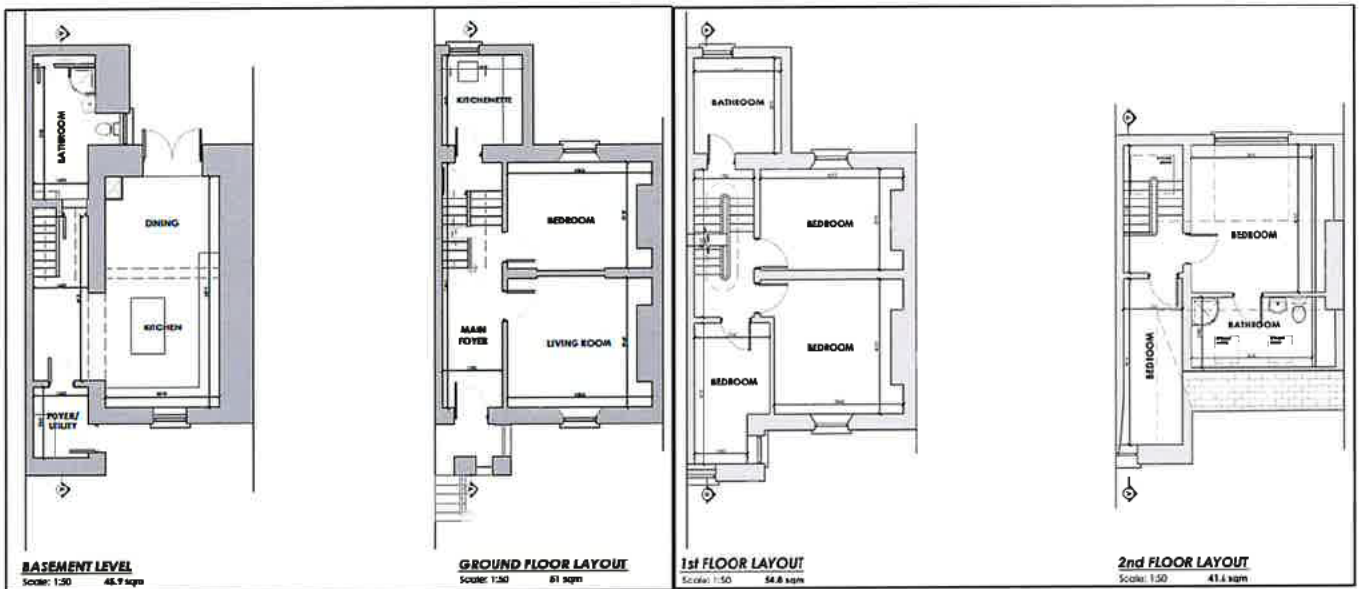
Floor plans of the subject site, showing the existing internal layout of the property.
